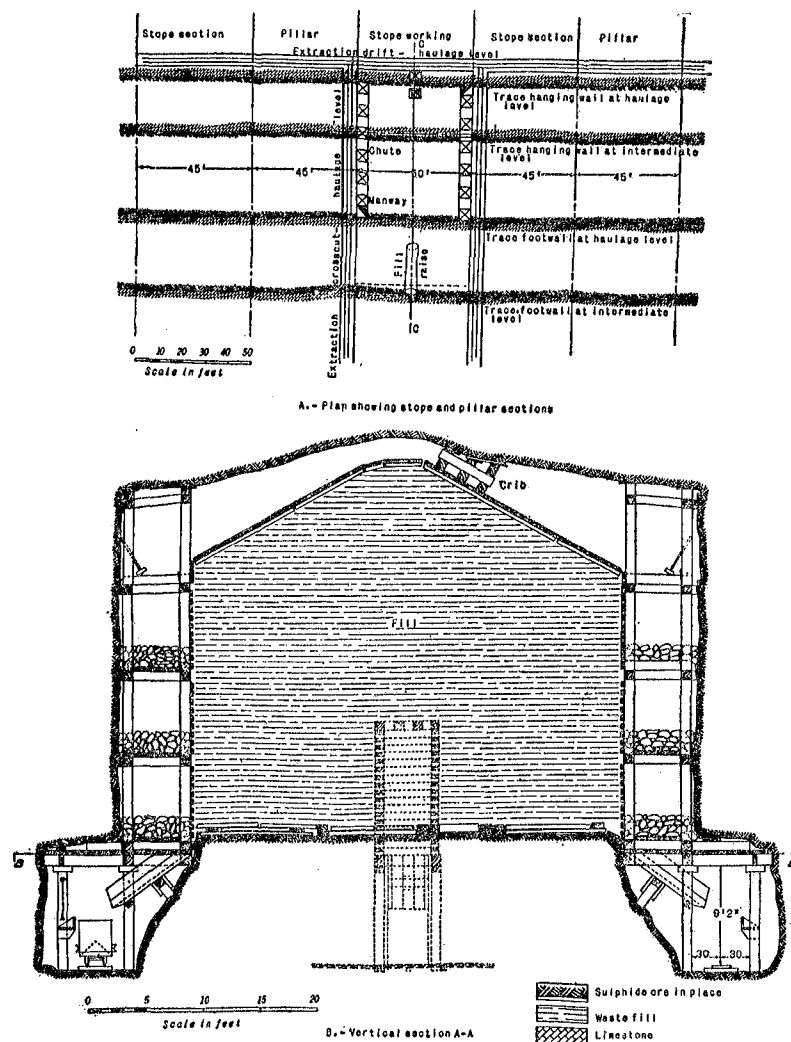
Double-lead, inclined, flat-bottomed, cut-and-fill stope with fill raise in footwall, Campbell mine.
